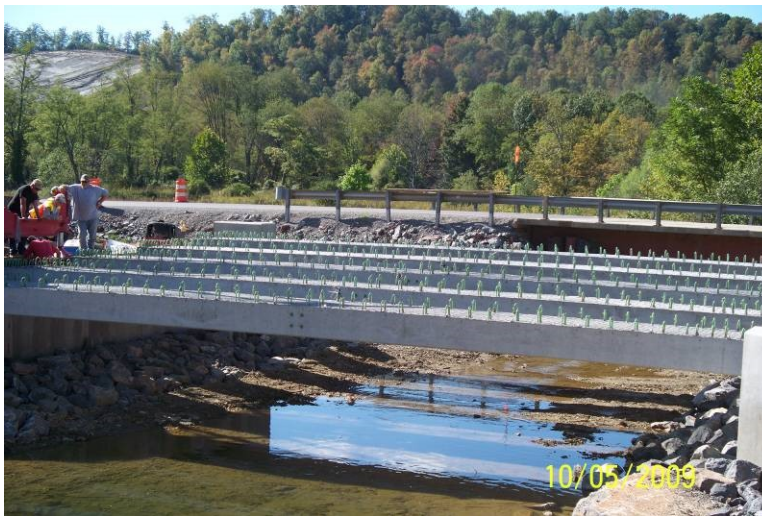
Stalnaker Run Bridge after placement of all five prestressed box beams; View from upstream location, north bank.
